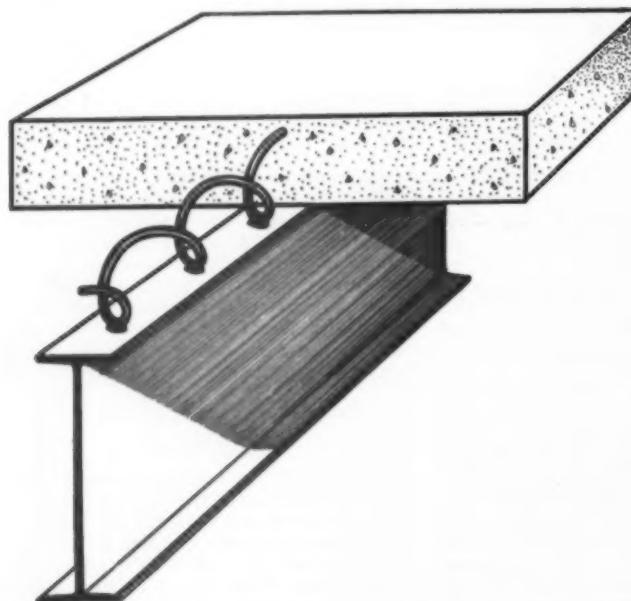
Spirals to Be Embedded in Reinforced Concrete Floor Are Welded to Top Flange of Supporting Floor Beams
